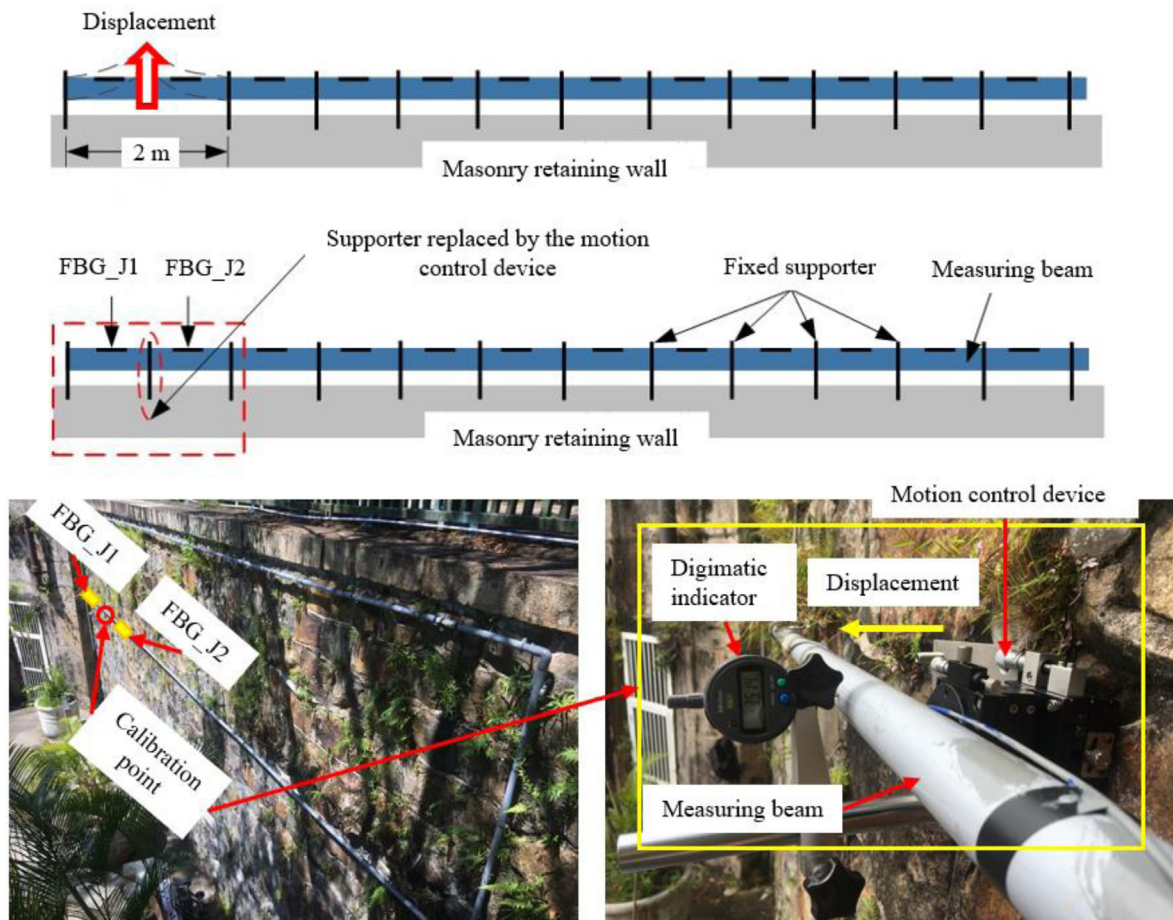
Illustration of the in-site calibration on the masonry retaining wall.
